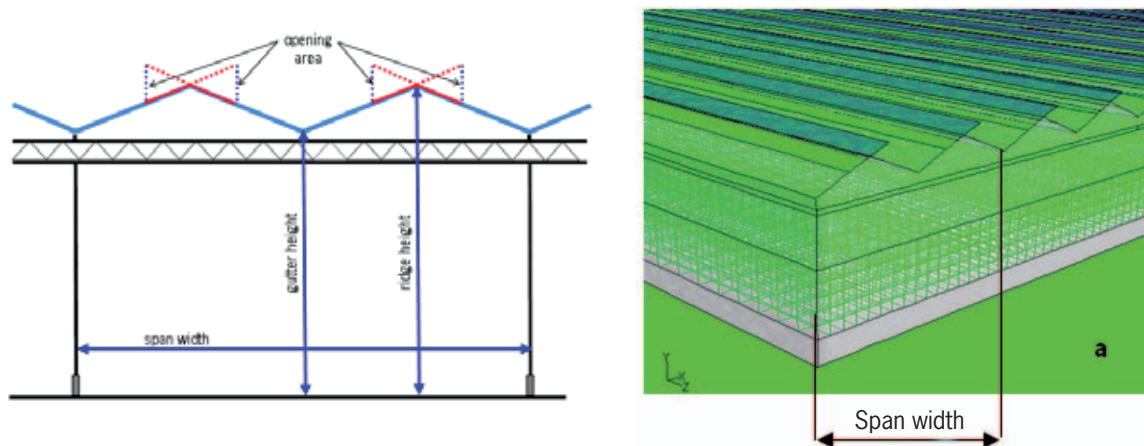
Design of a typical Venlo type greenhouse with continuous roof openings and different span width (9.60 m or 8.0 m)
